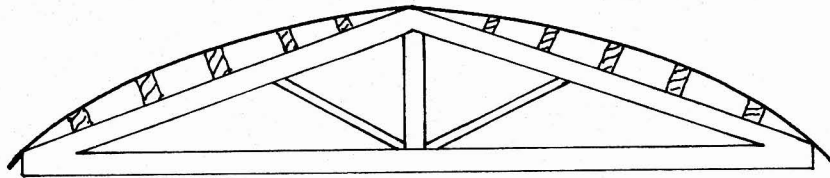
Barrel vault carried by spacers off a kingpost truss.
